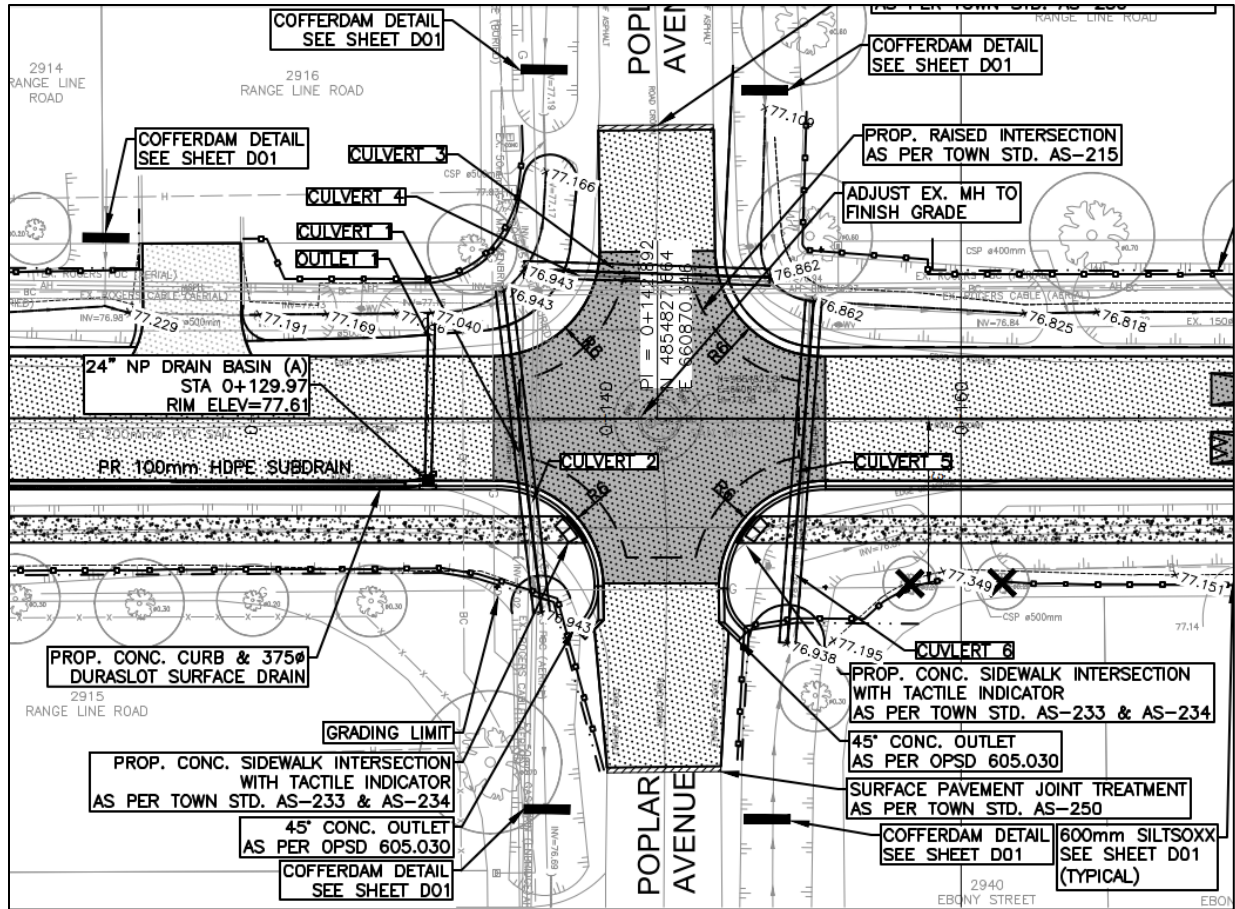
Intersection Layout with Slotted Drain System, Subdrain, and Culvert
